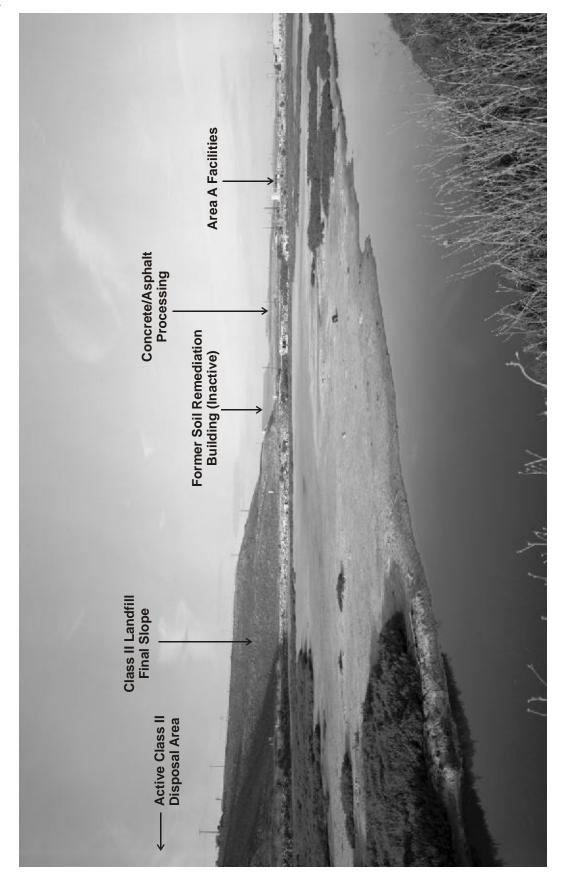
Existing Conditions from Viewpoint 1, Levee, Looking Northwest
